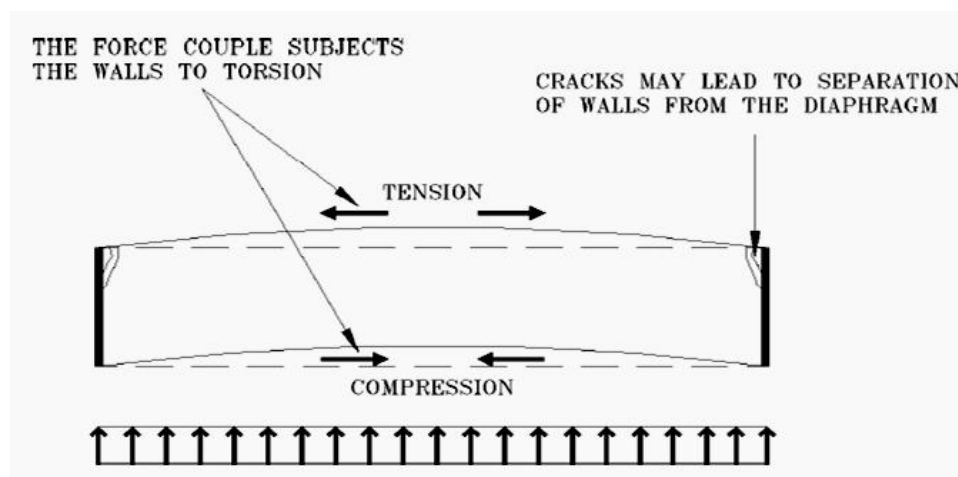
A plan showing bow action subjects the end walls to torsion
